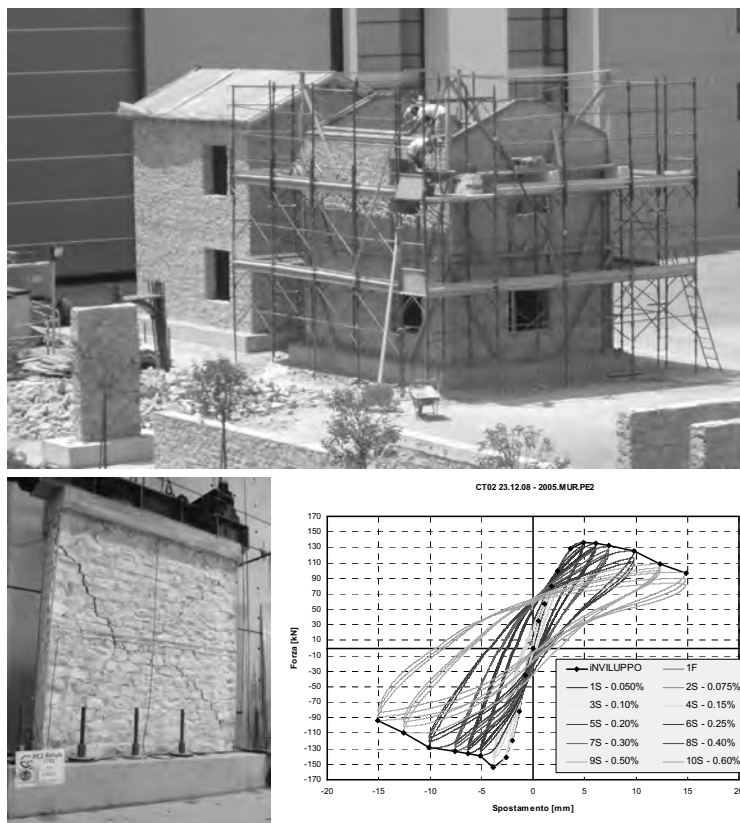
Construction of full scale stone masonry buildings (top) to be tested dynamically in Pavia and (bottom) shear-compression test on a double-leaf stone masonry wall (Galasco et al. 2009).
